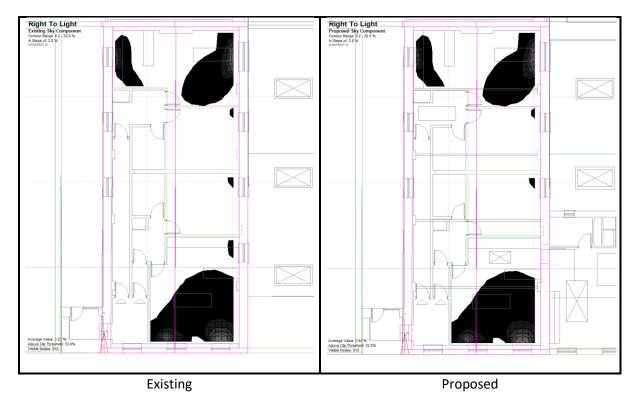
NSL for the first floor habitable rooms of No42 Birchington Road
